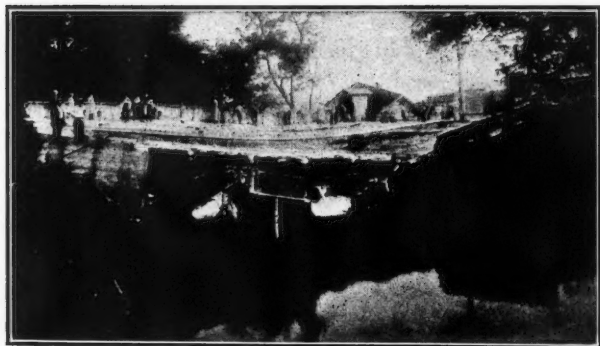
SOUTH ALAMO STREET BRIDGE.
